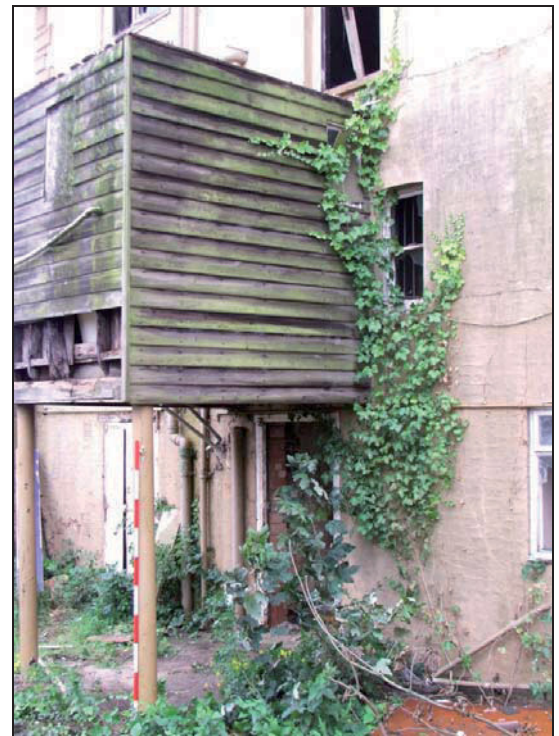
North elevation, rear entrance (C1) and extension (G7) from north-west
